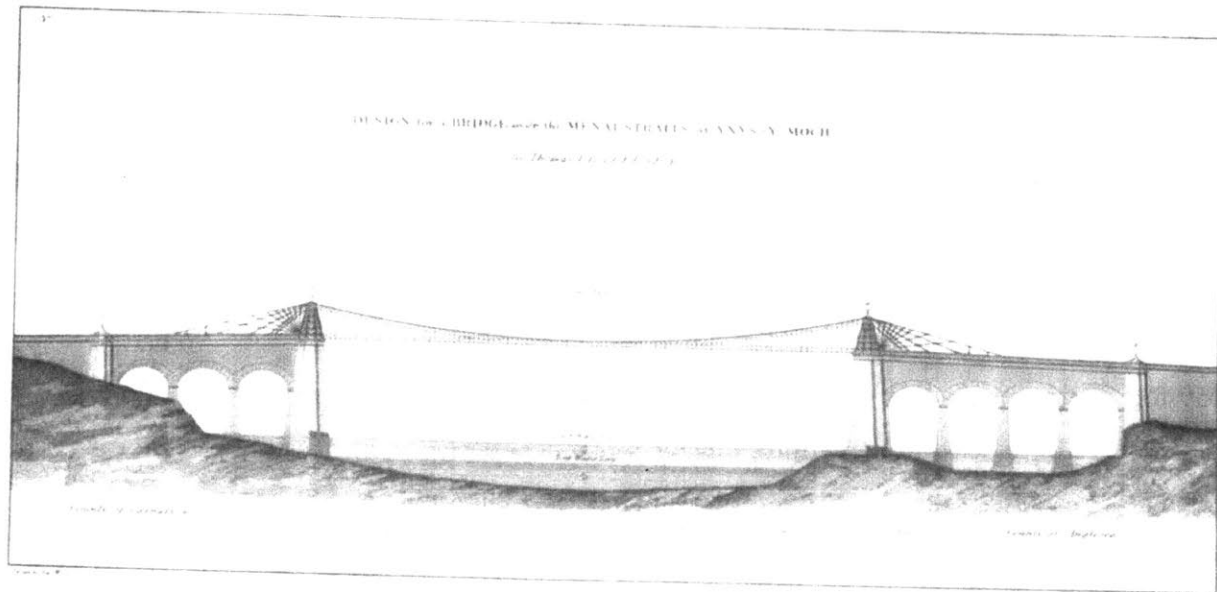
Original plan for Menai Strait Bridge (*Papers Relating to the Building of a Bridge over the Menai Strait 1819*)
